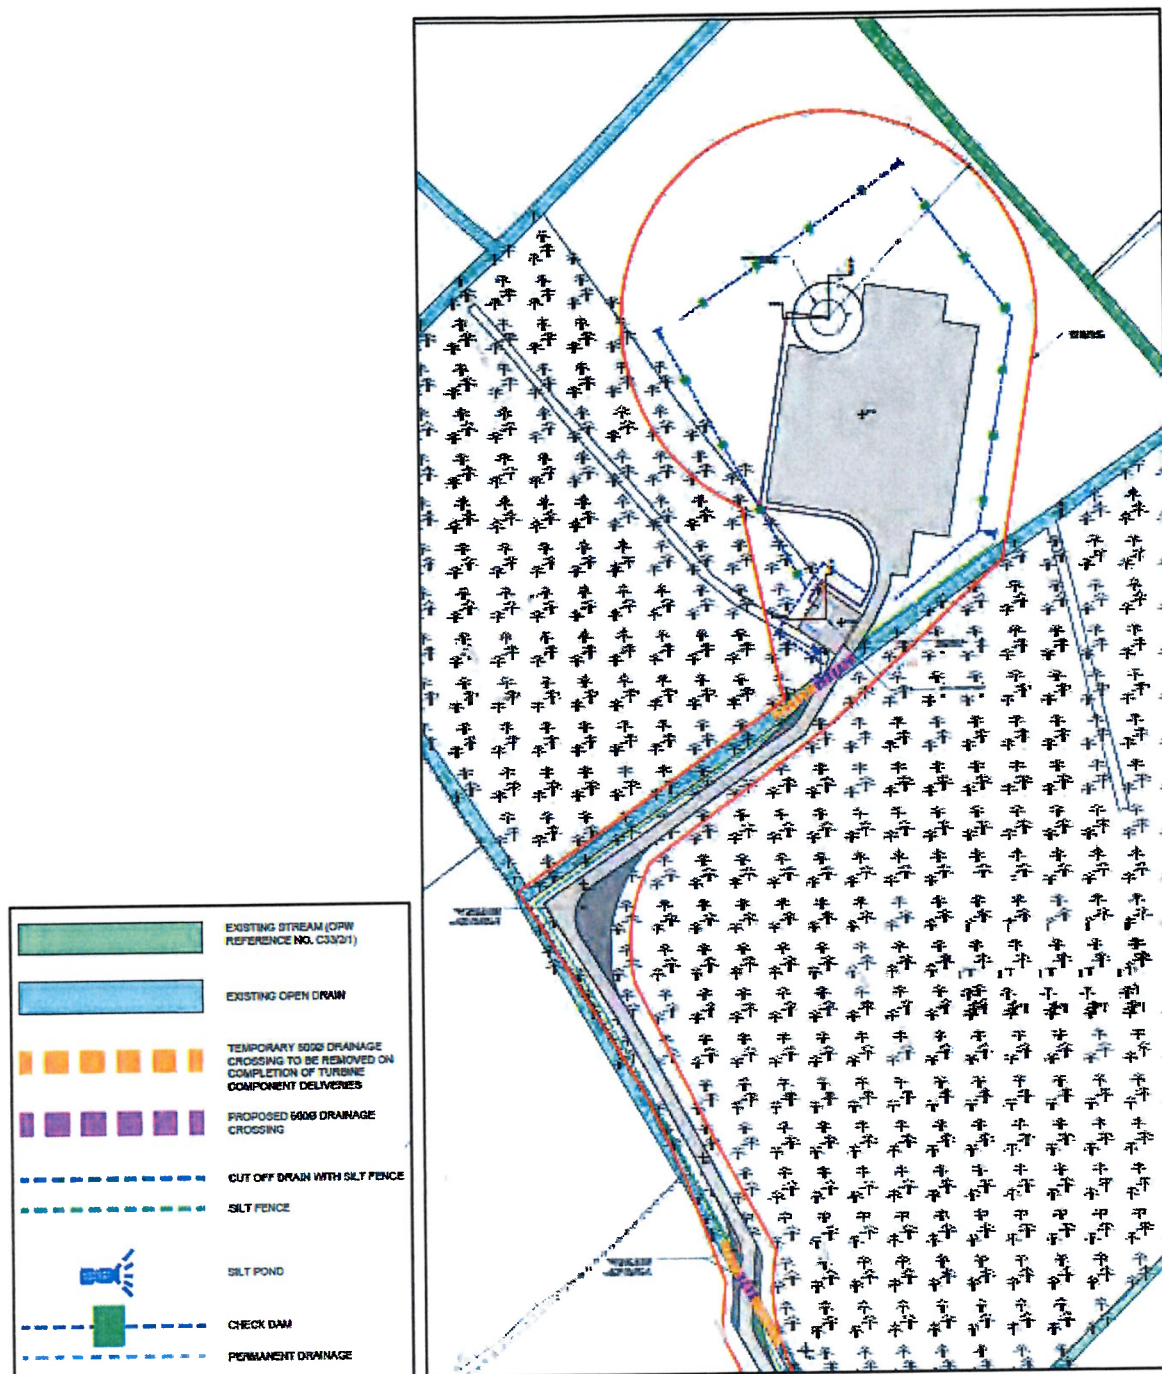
Drainage system that will be employed onsite. (Planning drawing 23528-101-P1)
